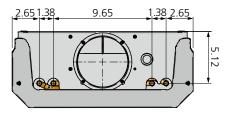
Dimensions ADRIATIC Prisma, end view water connection.
